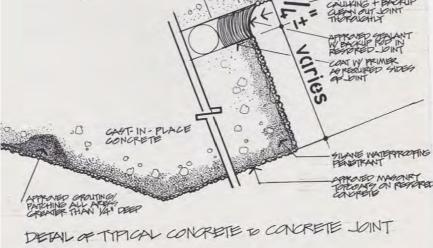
1986 Construction Detail for Typical Concrete-to-Concrete Joint. Eberson and Toto, Detail C/5.
